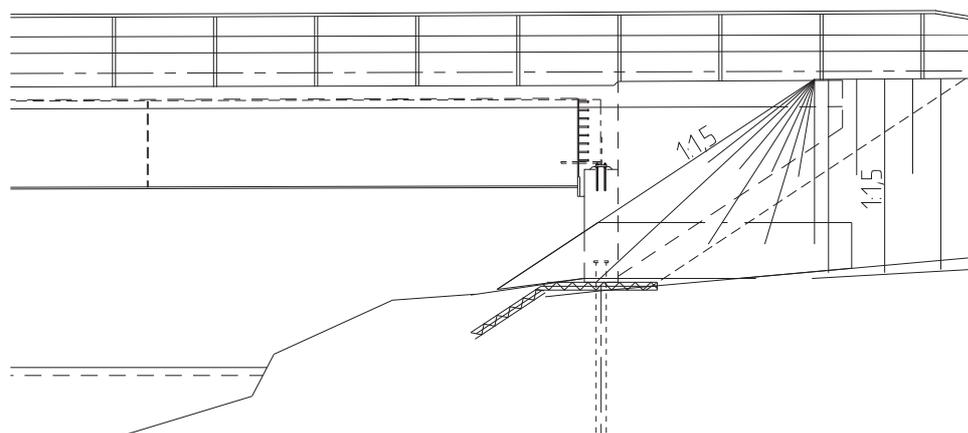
Integral abutment bridge which is supported by steel piles under the back wall.
